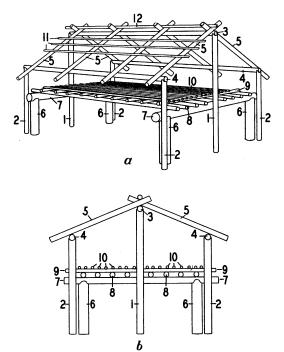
Side and Front View of Arapesh Pile House. a, Side view; b, Front view. 1, Posts supporting ridge pole; 2, Wall posts; 3, Ridge pole; 4, Wall plates; 5, Rafters; 6, Floor piles; 7, Main floor plates; 8, Longitudinal floor plates; 9, Transverse floor plates; 10, Flooring of *limbum* or elephant grass; 11, Longitudinal lathes to take thatching; 12, Supplementary ridge pole.
